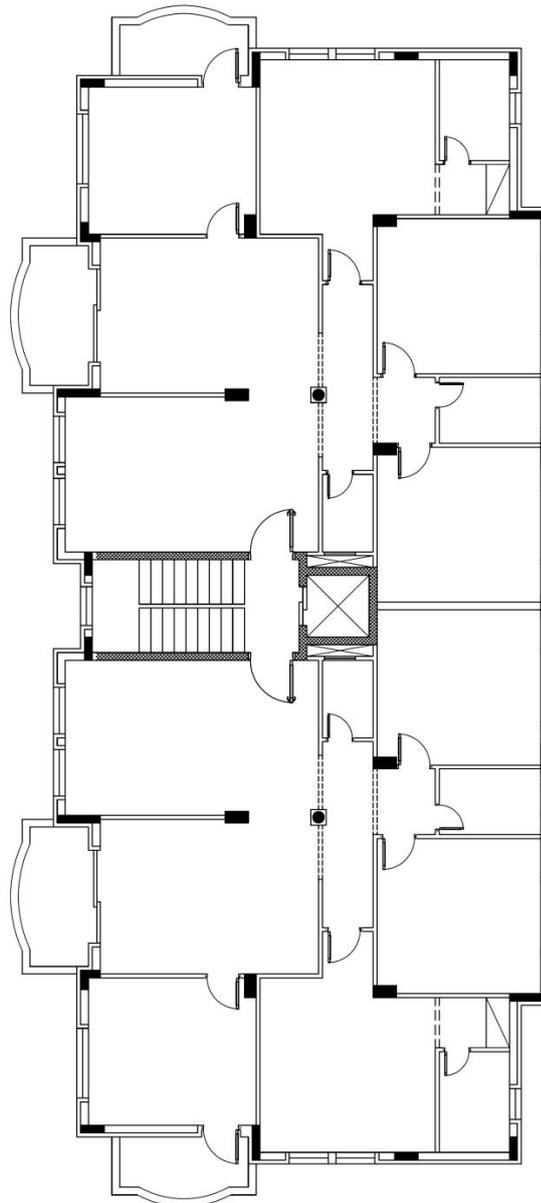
Typical Architectural Plan for a Frame Concrete Building
